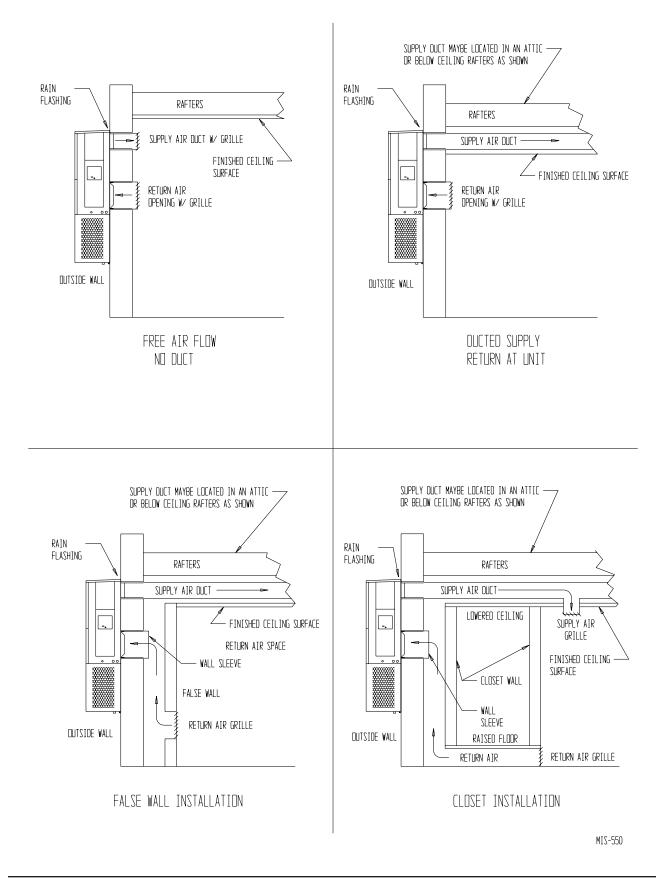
WALL MOUNTING INSTRUCTIONS
